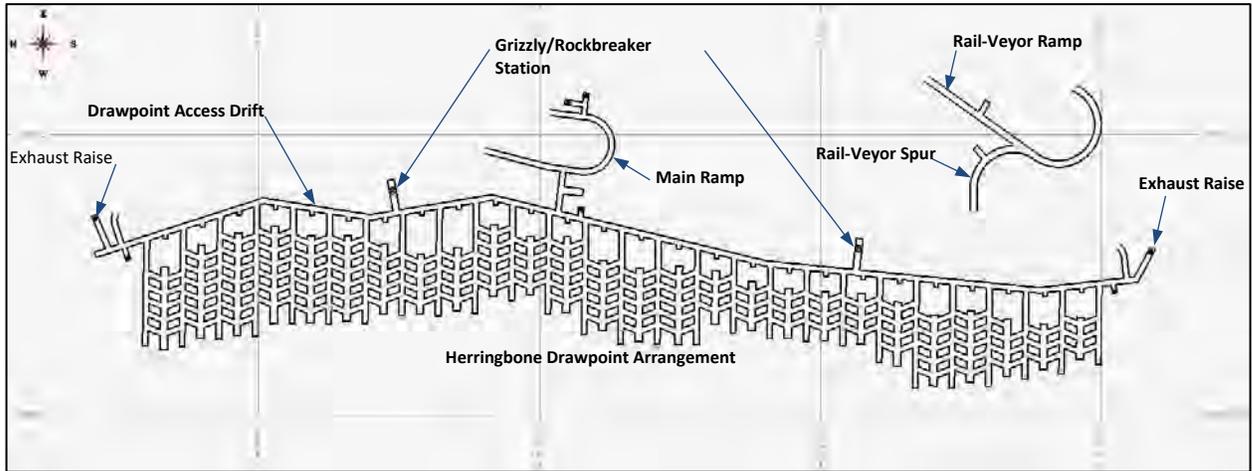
Plan View of Typical S&MB Drilling/Rail-Veyor Loading Level
